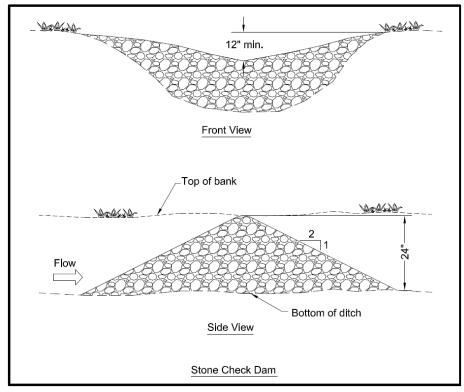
Profile and Cross-Section of Typical Rock Check Dams
